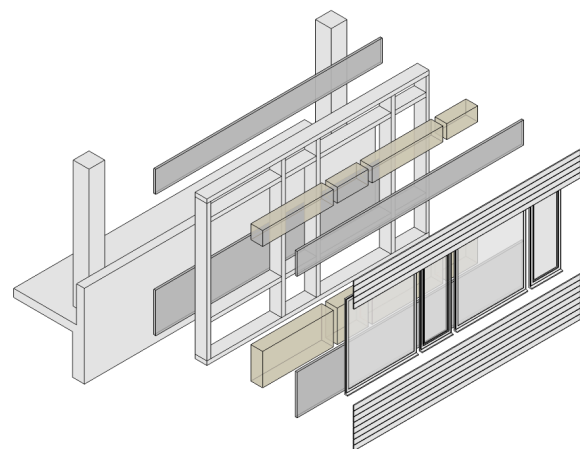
Wall explosion drawing of RSB. Layer from outside: cladding larch oil impregnated, windows 3-layer IG, gypsum fibre board, mineral wool 300 mm, timber frame spruce 300 mm, OSB board.
